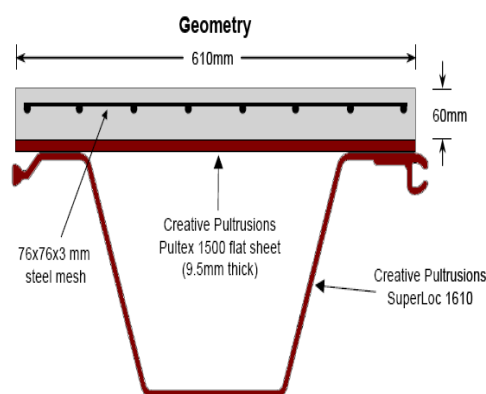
Dimensions of girder 6 and 7 (Honickman, 2008)
